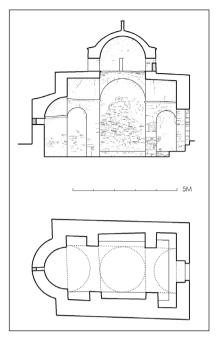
Christos at Kathanychta. Plan and longitudinal section.
